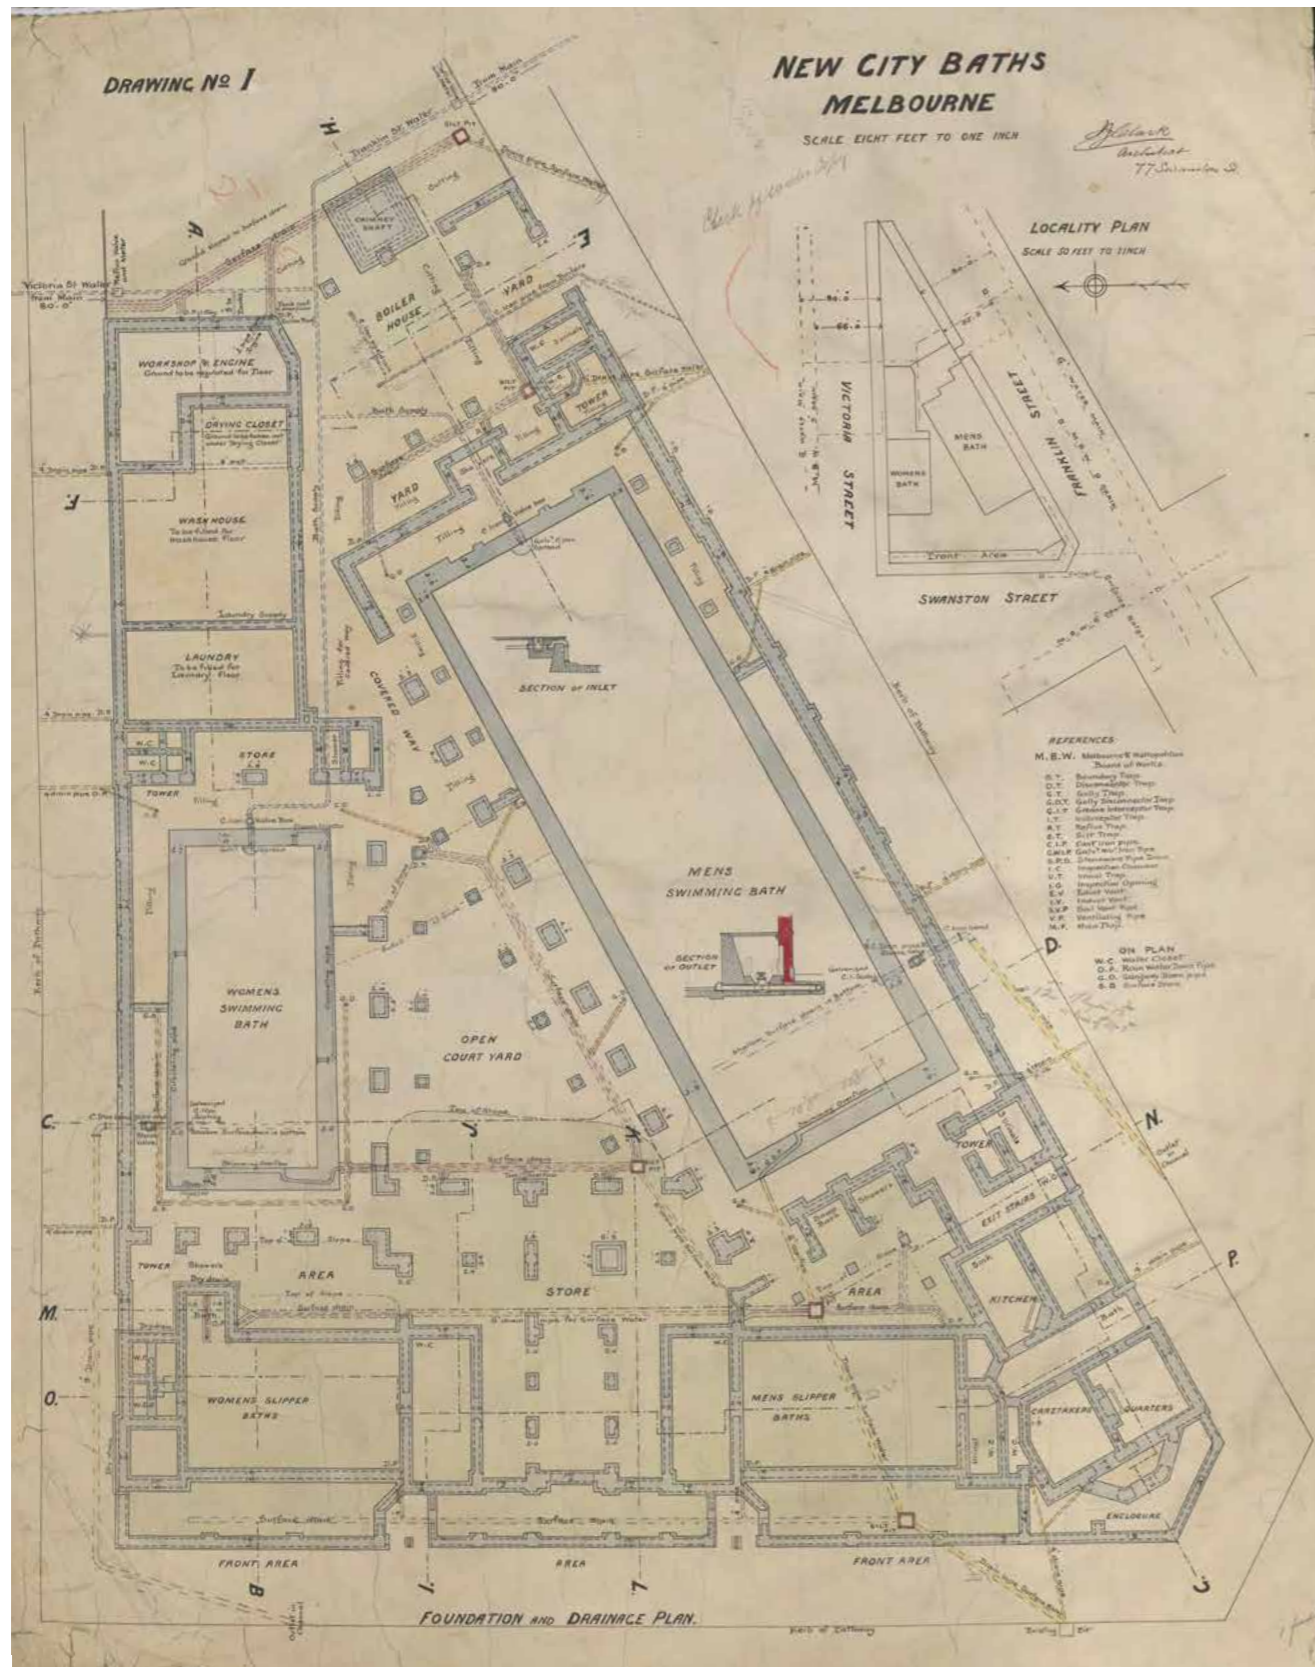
Drawing no. 1, Foundation and Drainage Plan, New City Baths Melbourne, 1904
